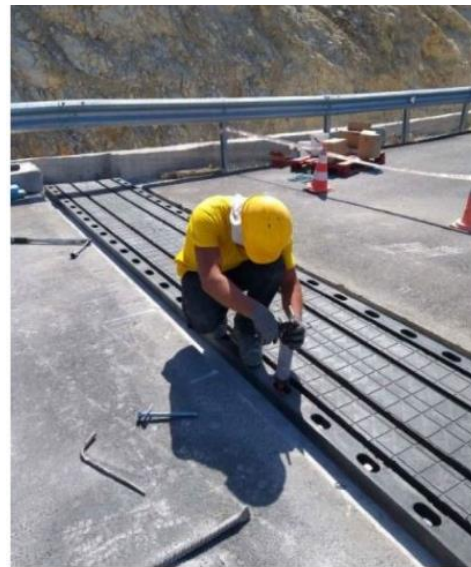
Existing condition of one damaged Highway Bridge Joint
